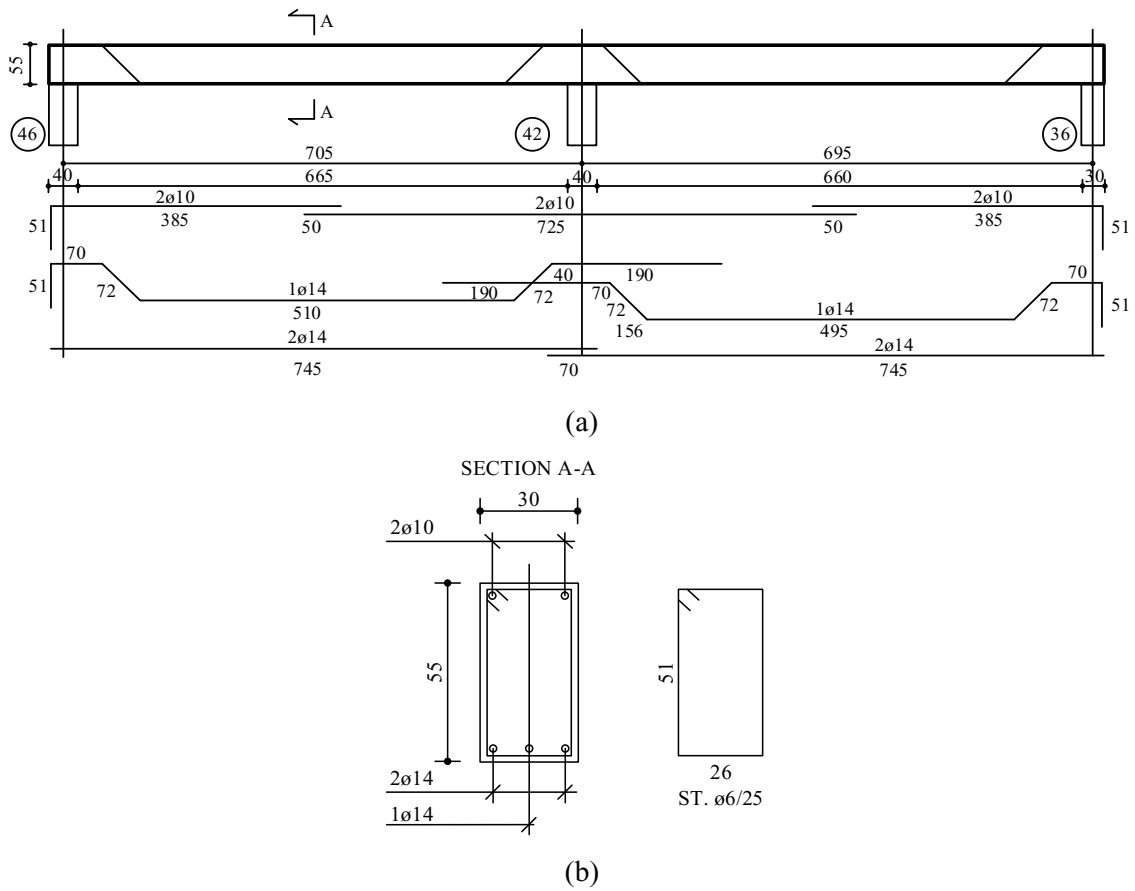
RC beam 46-42-36: (a) dimensions; (b) section A-A
